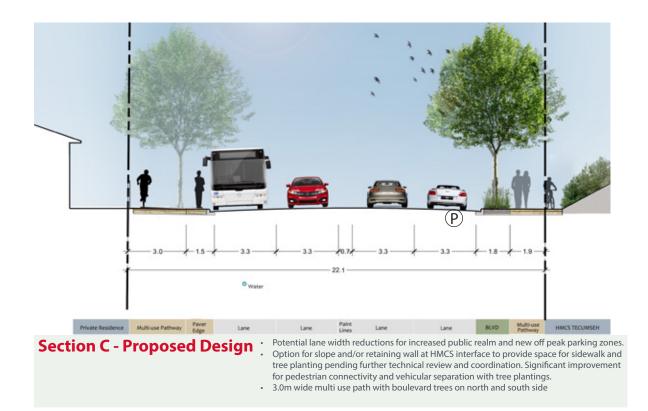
Zone 4 (Residential and Mixed Use Gateway Zone 25a St - Crowchild Bridge) Concept Design
